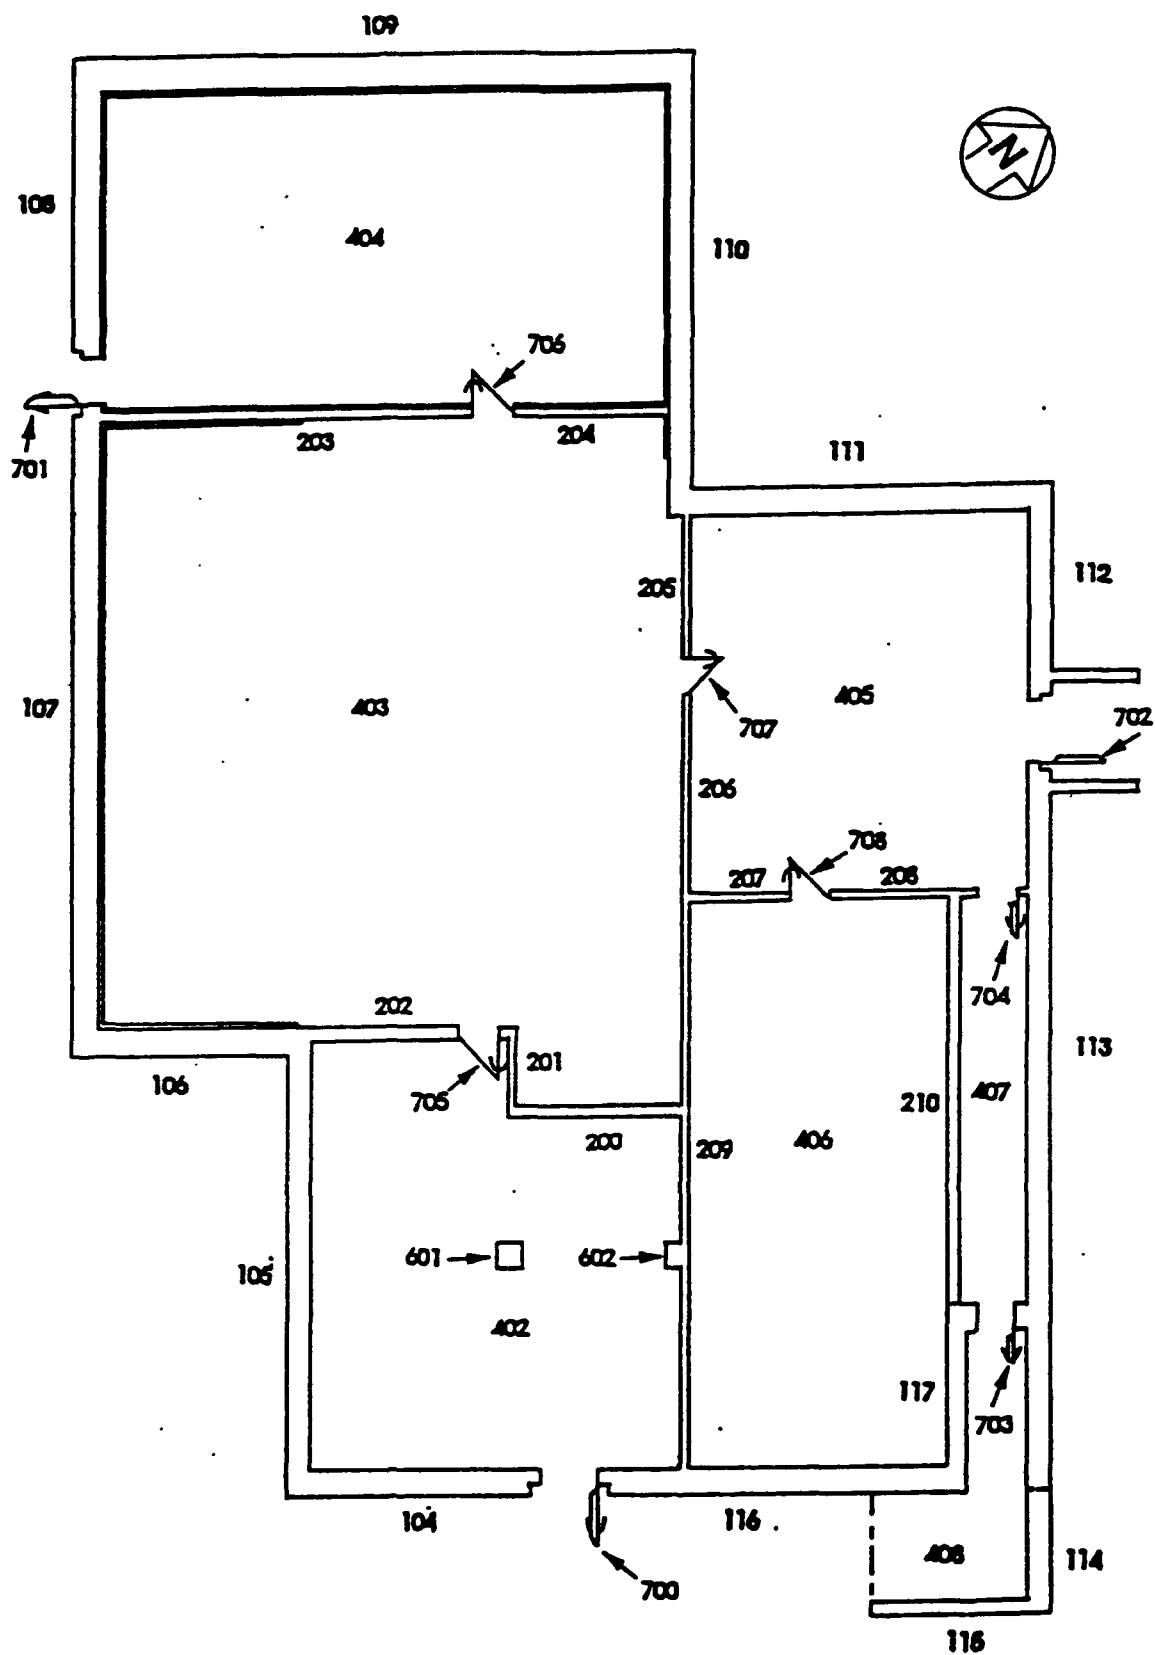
Line Drawing Floor Plan - Building 138 (Bitburg AB).
